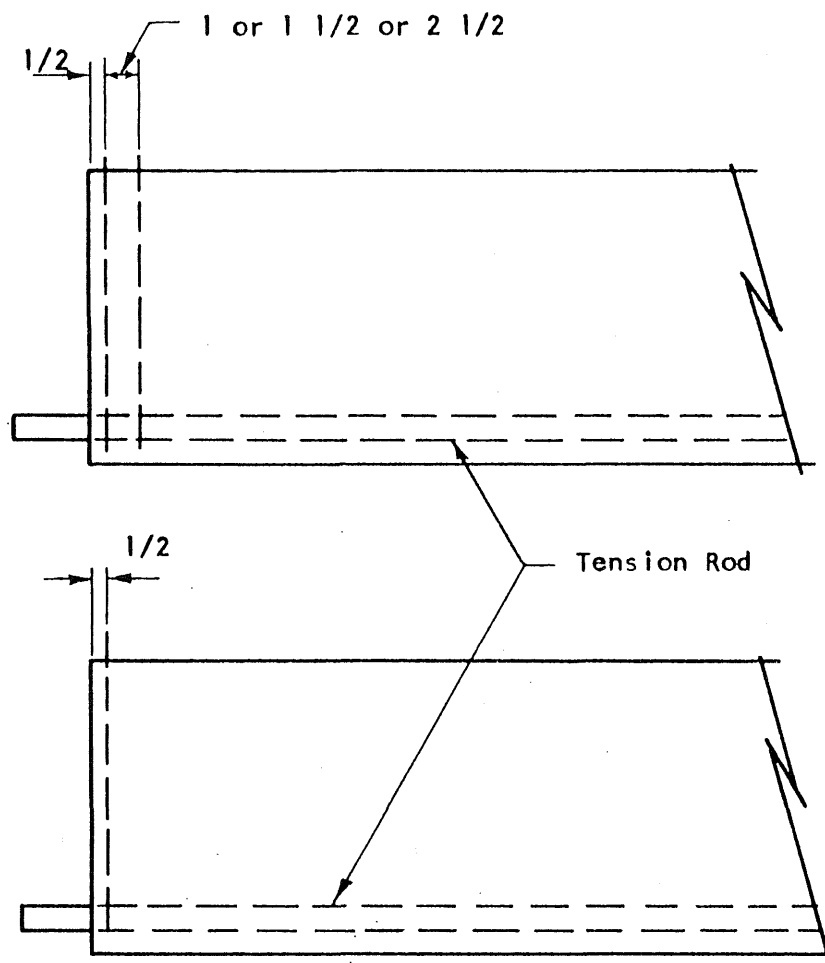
NOMINAL DIMENSIONS OF TEST SPECIMENS
